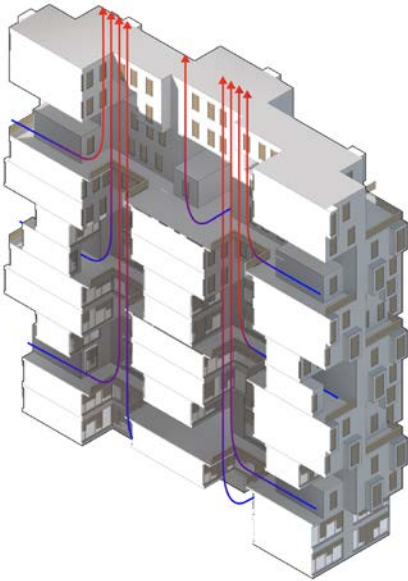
Axonometric section view. Through convection (stack effect), air rises through the internal vertical shafts providing natural ventilation. Air is sucked in through the holes connecting the shafts to the outer facade. Air flows over a system of water pools and vegetation for additional cooling.
